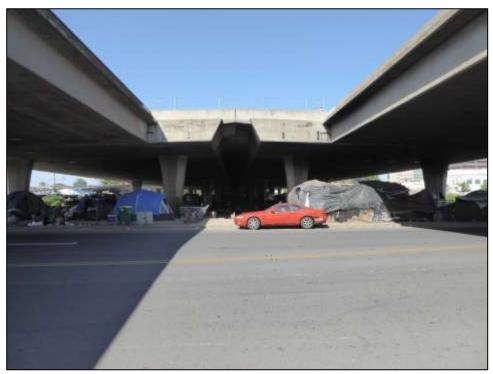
El Dorado Street undercrossing with eastbound onramp, camera facing northeast, April 28, 2022.
